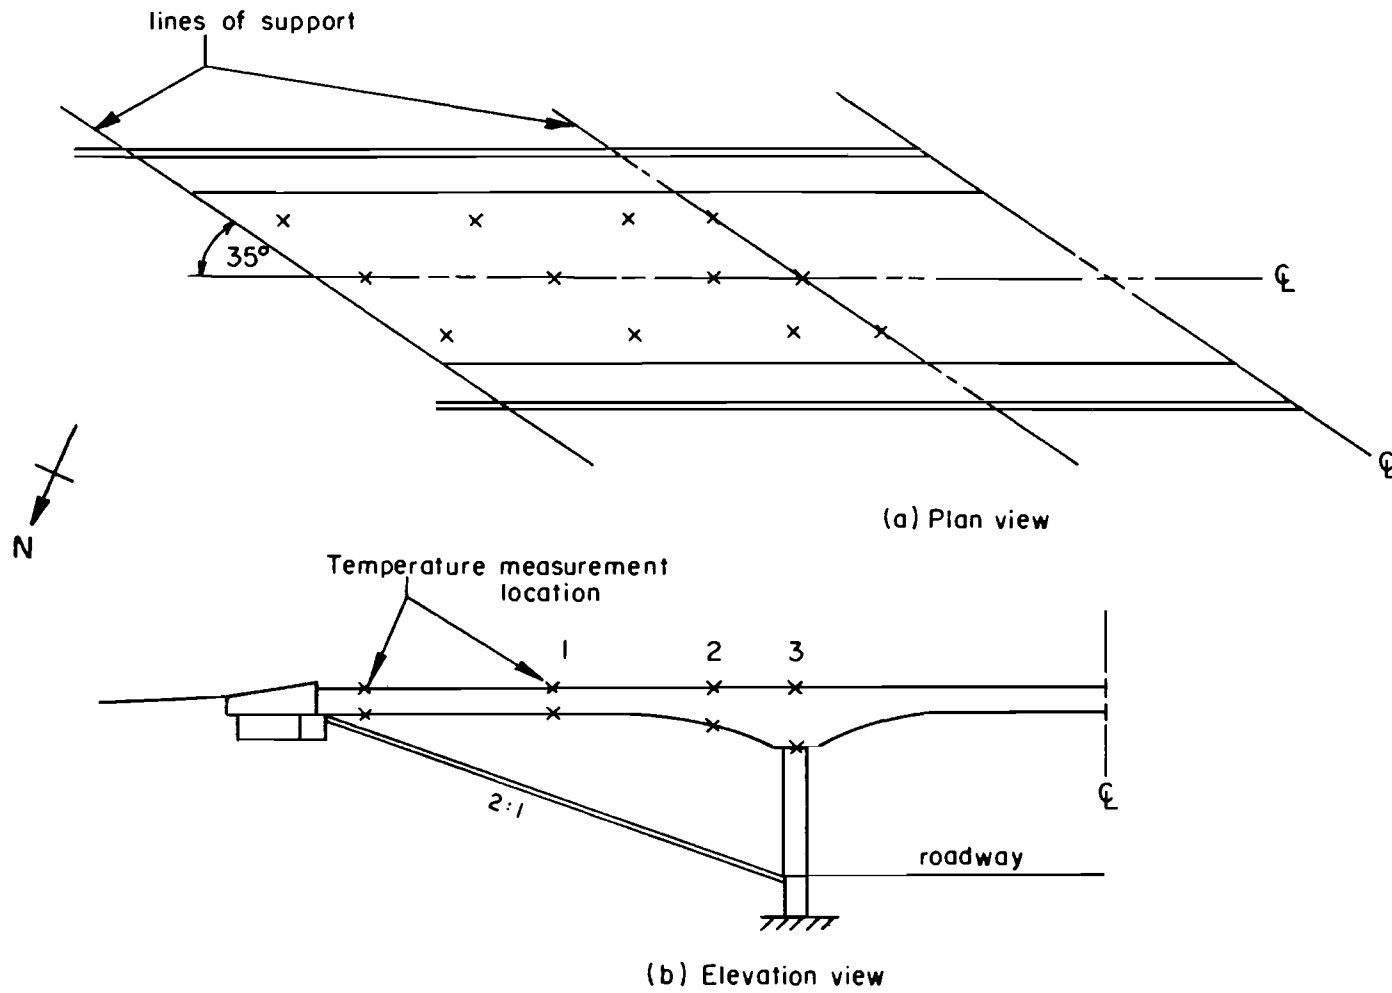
Three-span post-tensioned concrete slab bridge.
